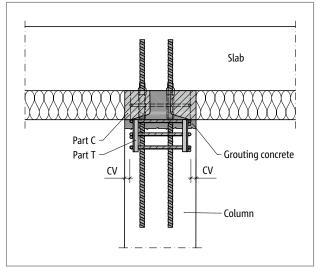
Schöck Sconnex* type P: Installation section; connection column – floor with Part C and Part T
